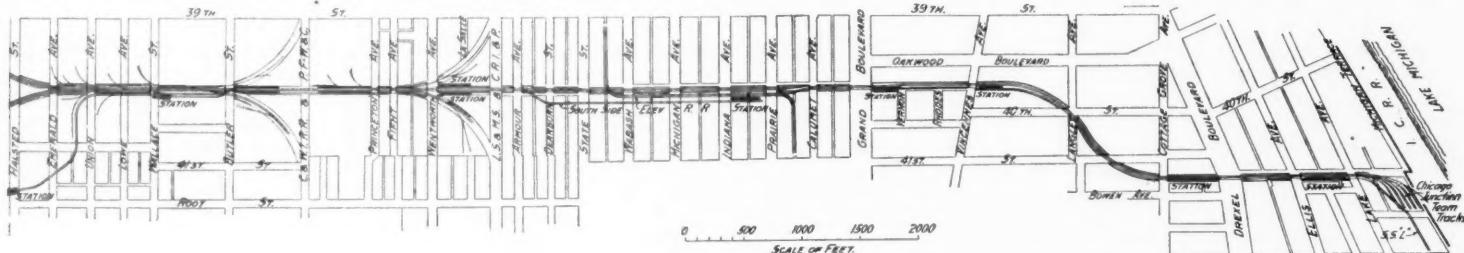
Map of 40th Street Track Elevation Work: Chicago Junction Railway.
